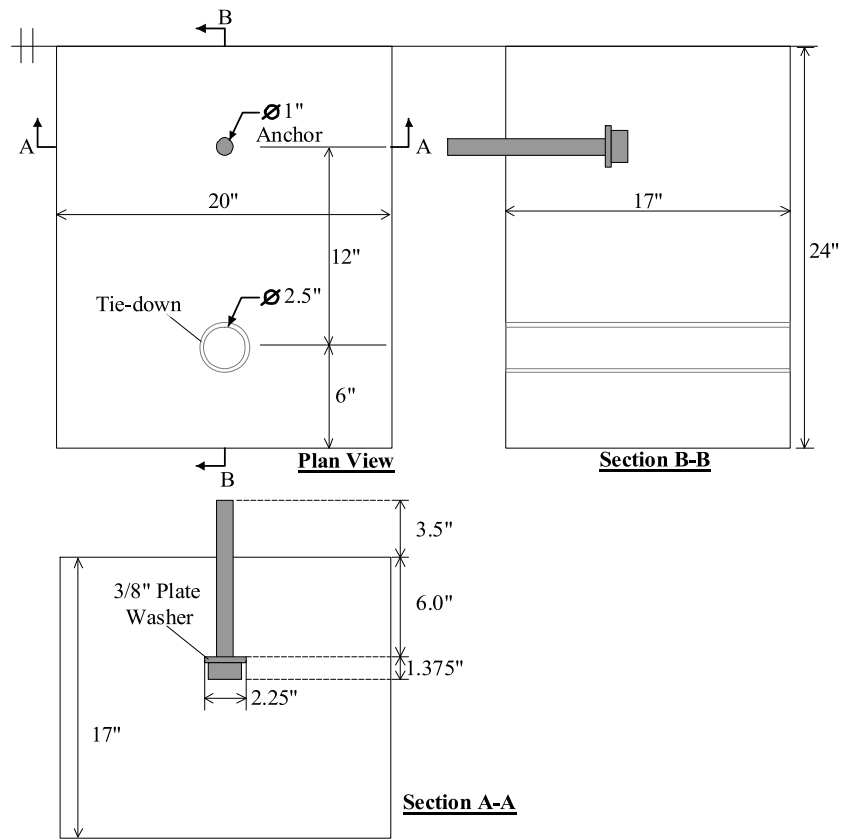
Test specimen for the tests of anchors reinforced with Type G reinforcement
